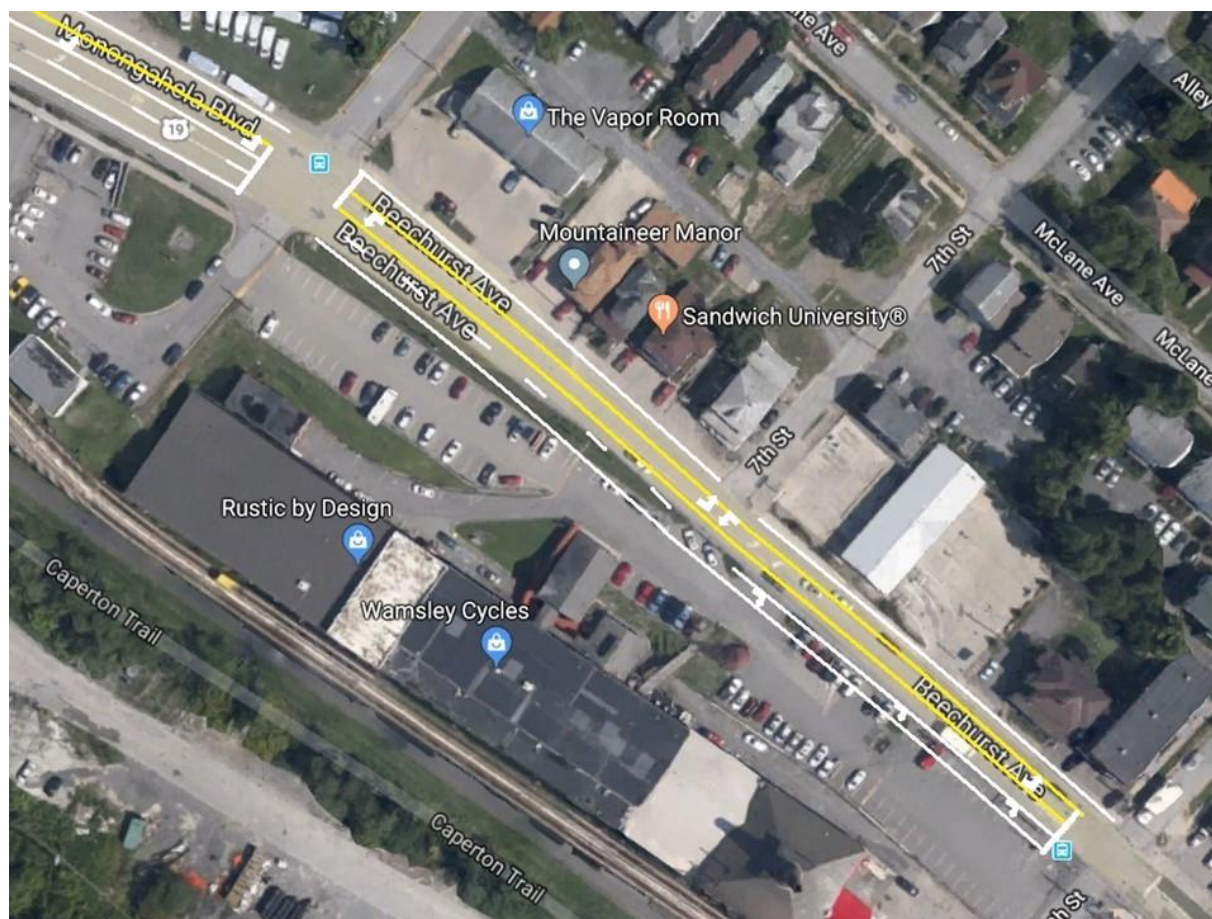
Widen to 4 Lanes Between 6th Street and 8th Street
